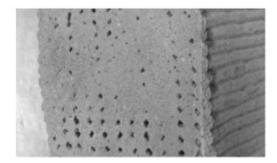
Sectional view of a concrete printed wall: Note the voids formed between the filaments (Source: Le & Austin, 2012)
